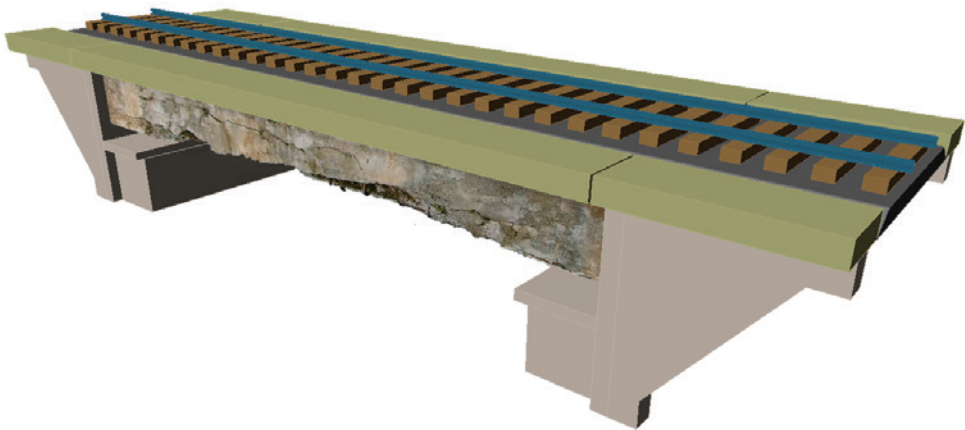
Application of the photo documentation in 3D model of the damaged structure
